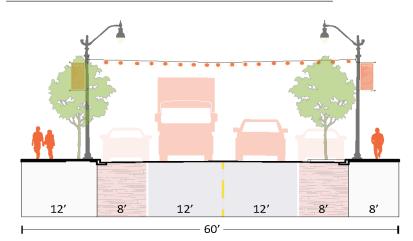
C (1). Van Emmon Street (Long-term).
